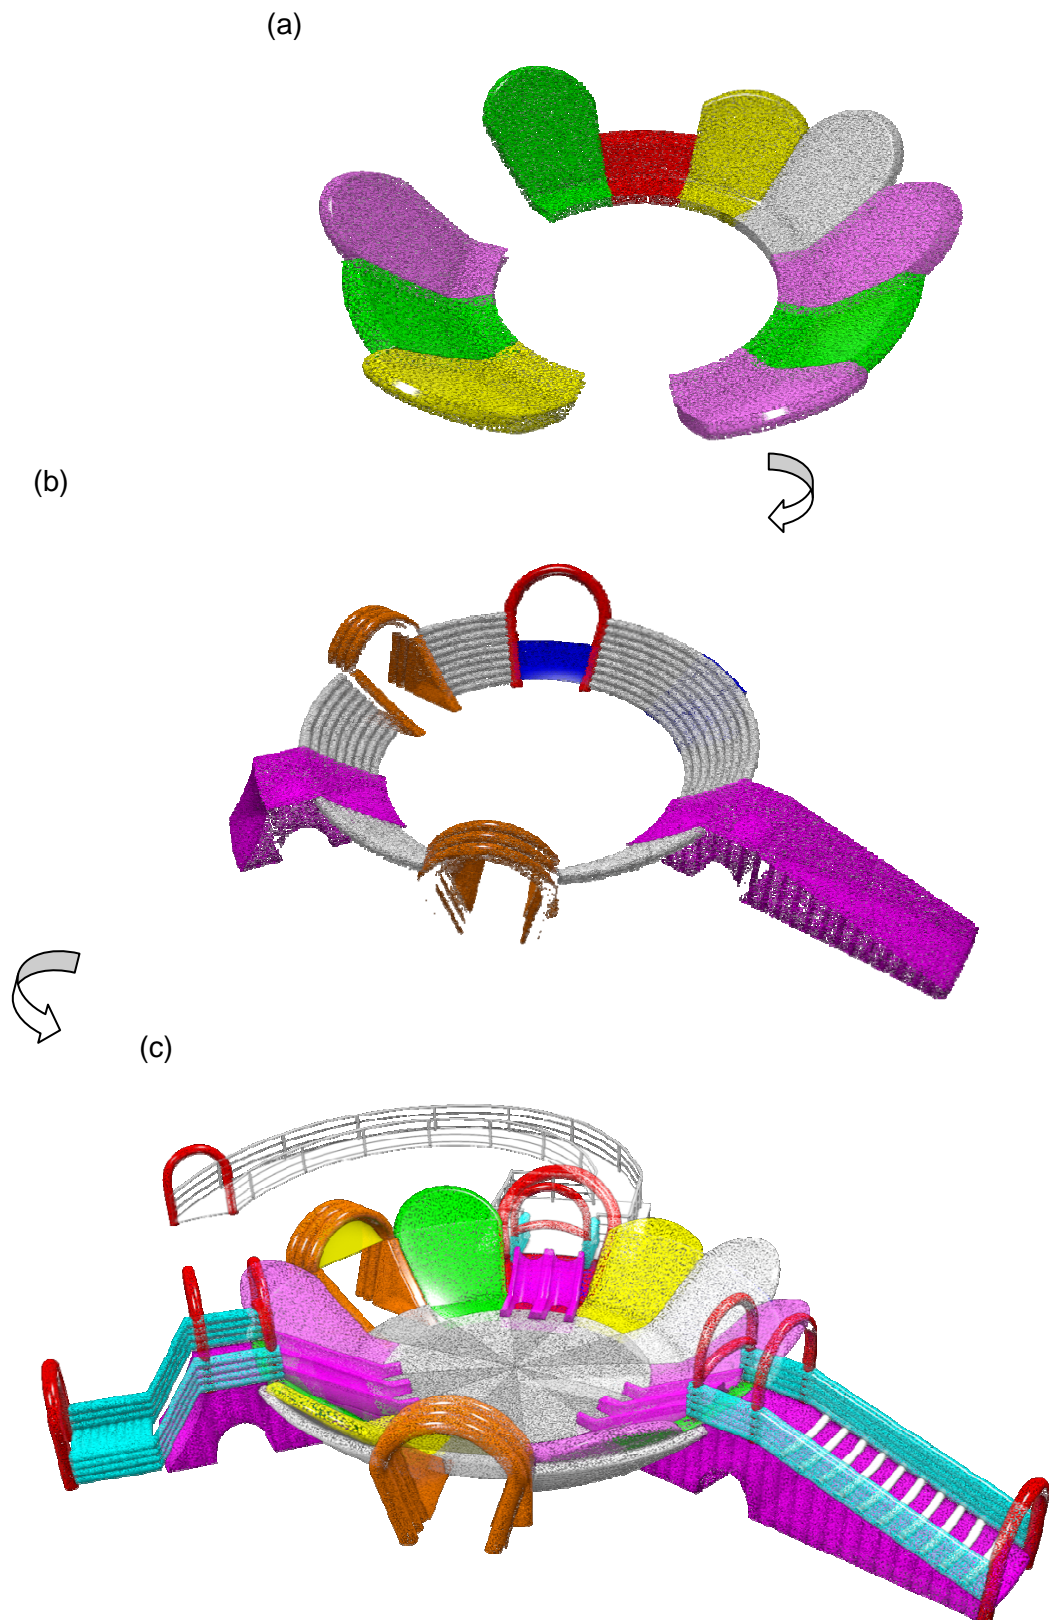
14: Elevated play components perspective views. (a) Secondary structure; (b) Primary structure; (c) Complete structure.
